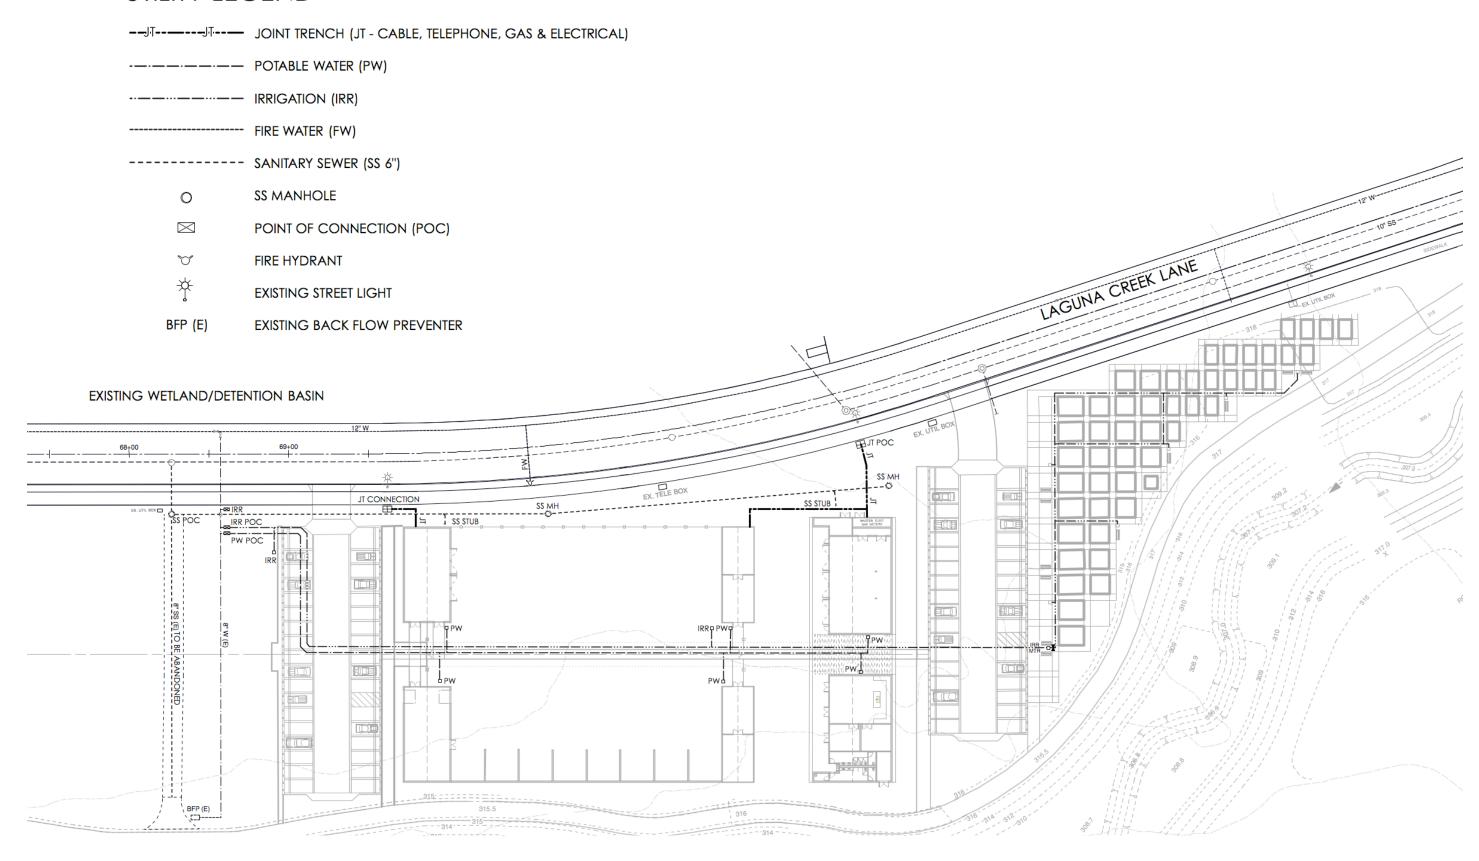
SUB-AREA 7 - UTILITY PLAN
